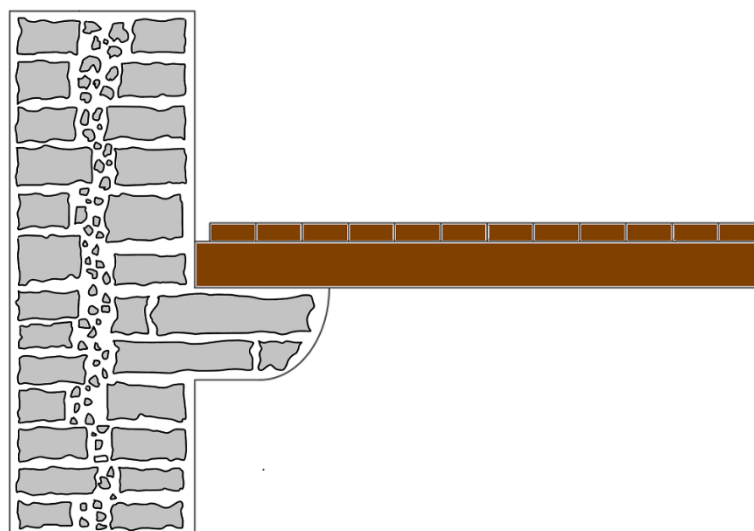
Connection detailing where the beams are laid in bracket elements.
